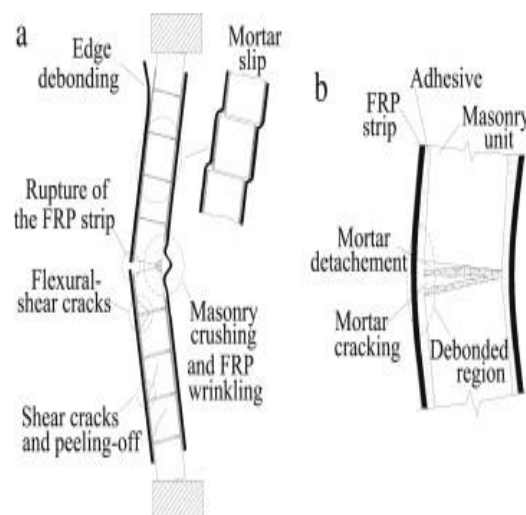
Possible out of plane cracks on a masonry wall.
